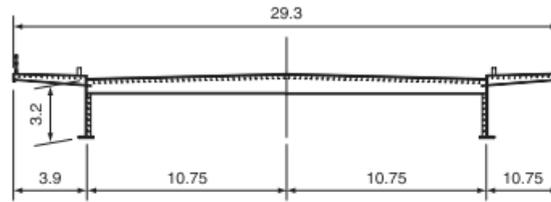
Twin girder steel deck (Weiwei Lin, 2017)
